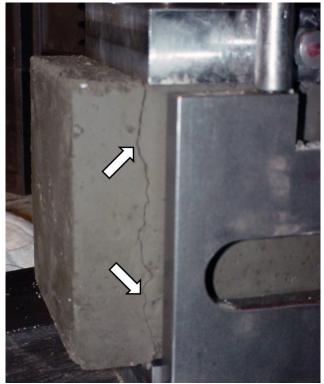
Vertical crack in shotcrete test specimen.
